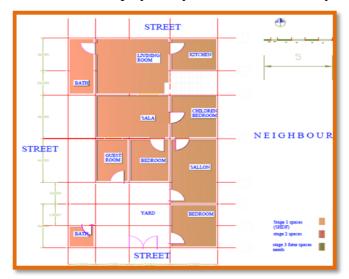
Awad NorAldieen Mohammed house Ground floor plan
